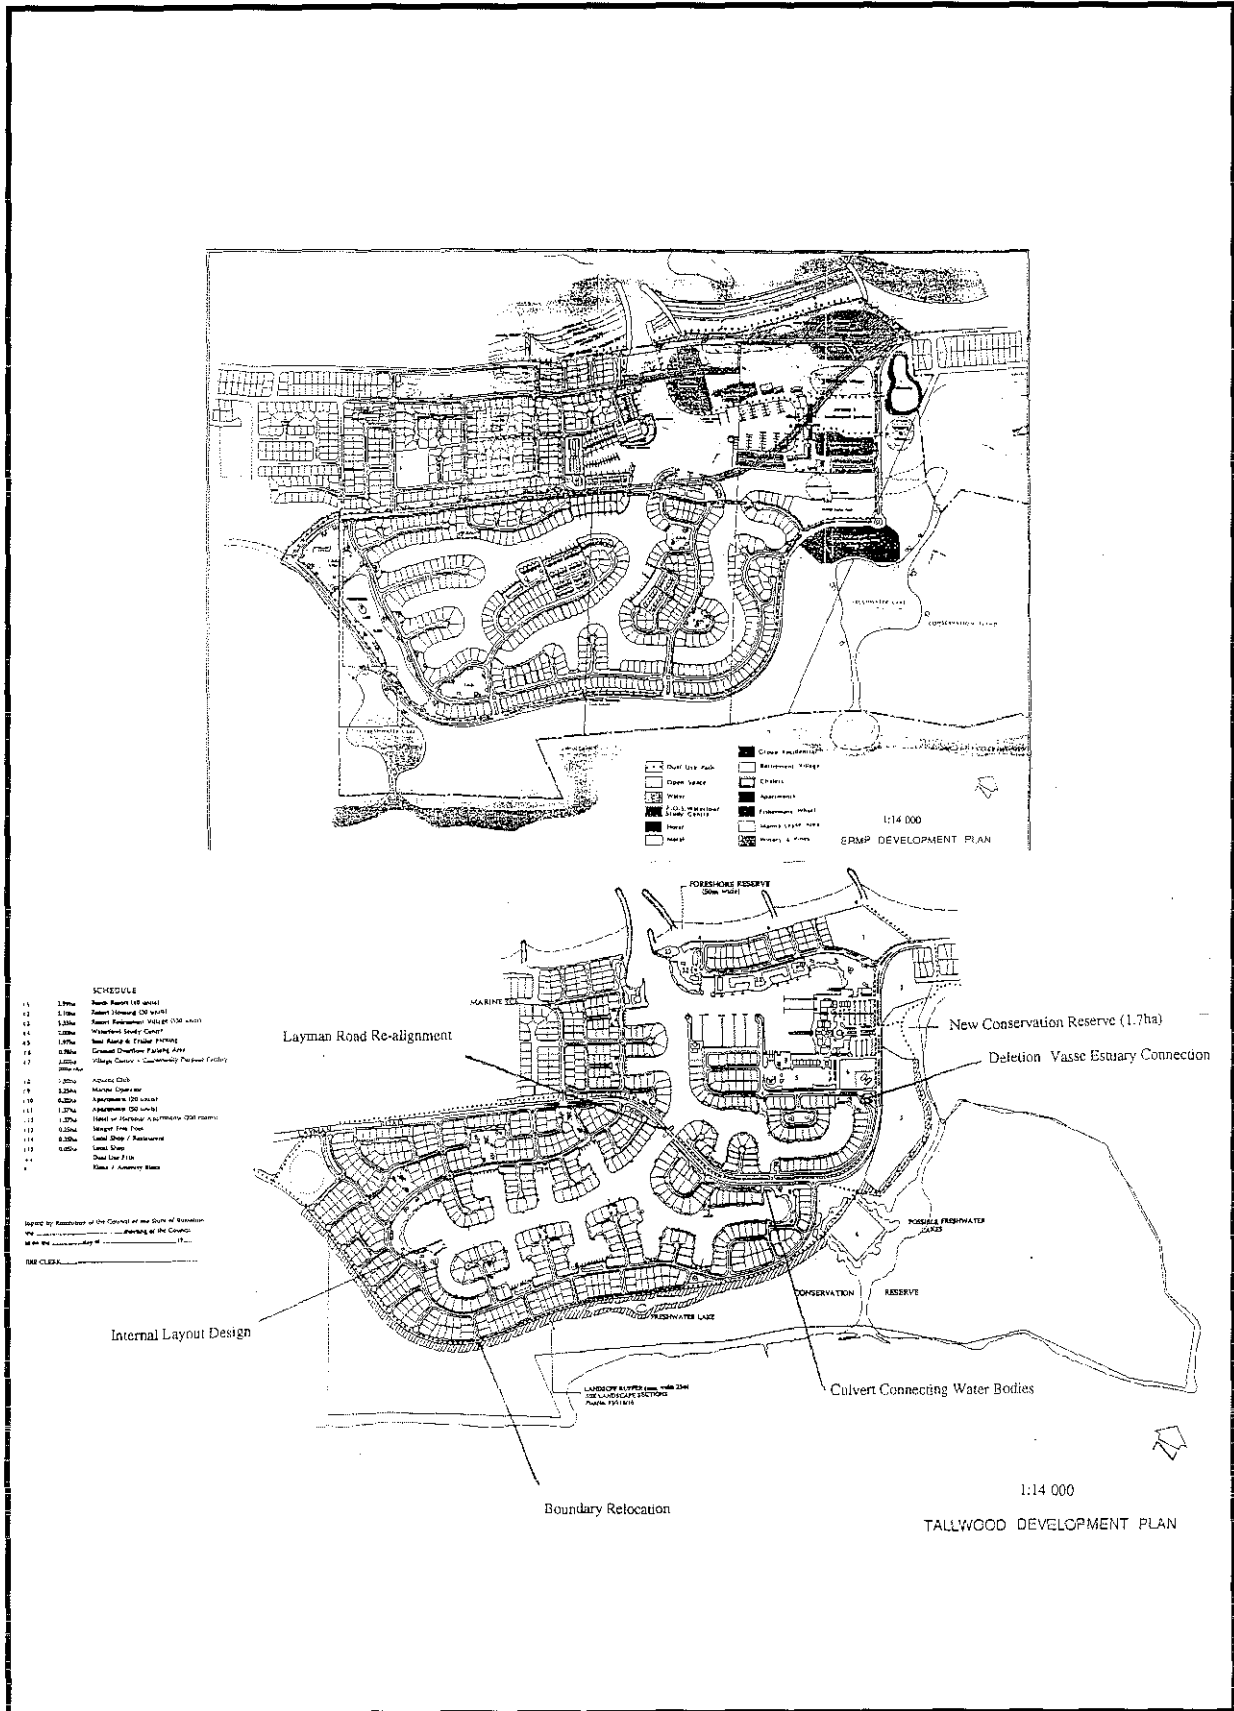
The ERMP (Original Plan, 1989) in Comparison With the Tallwood Development Plan (Revised Plan, 1995).
